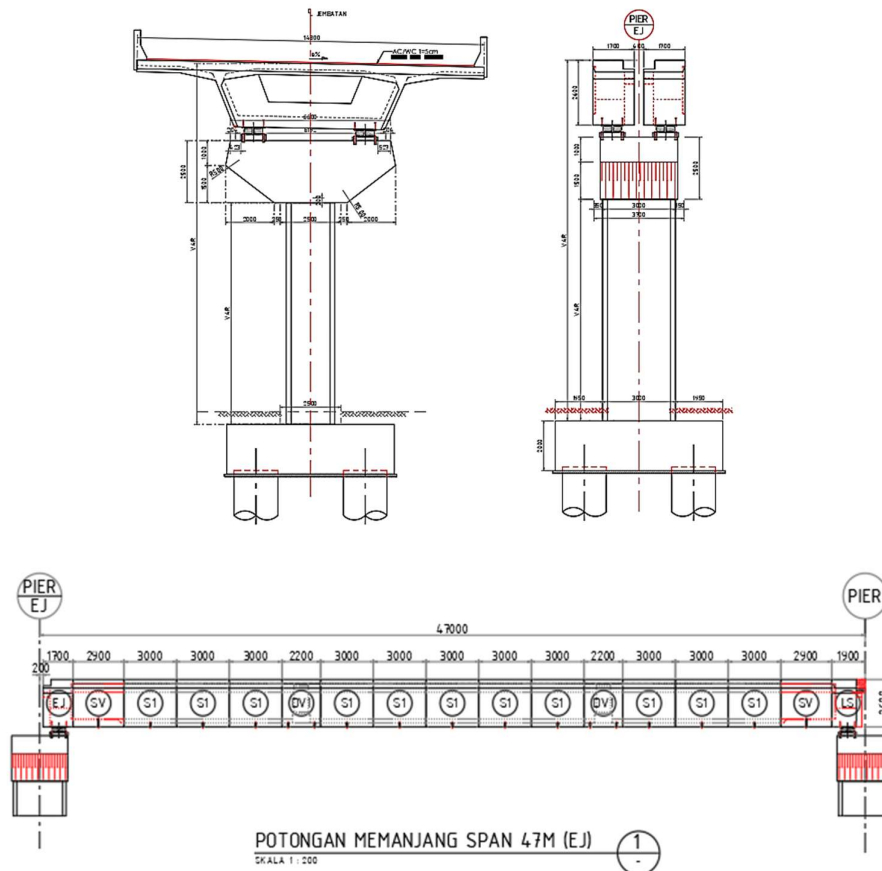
Bridge Structure Design Harbour Road 2 Tol Road Project
